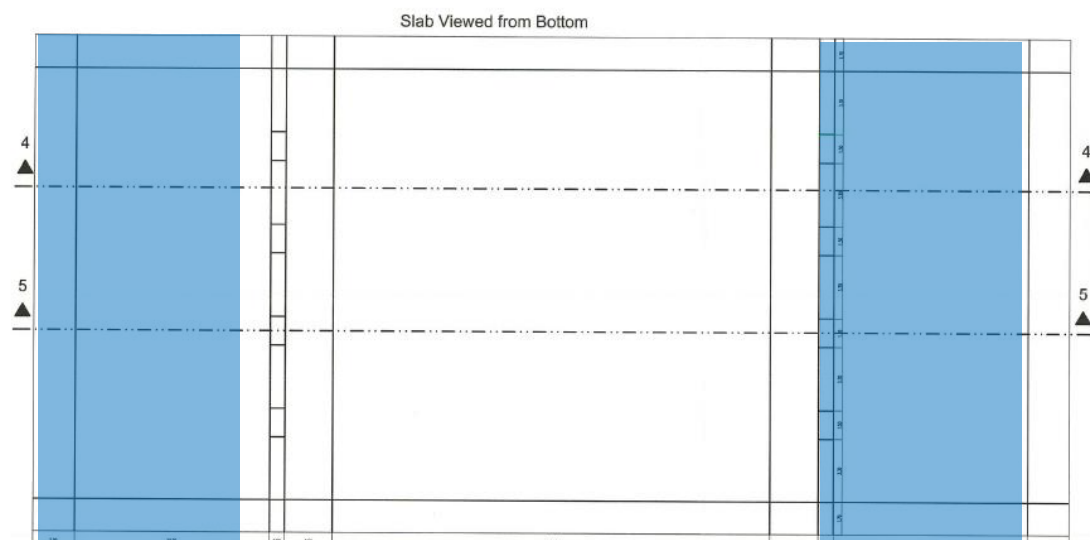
Arch slab view from bottom side and location of cantilever arch slabs
